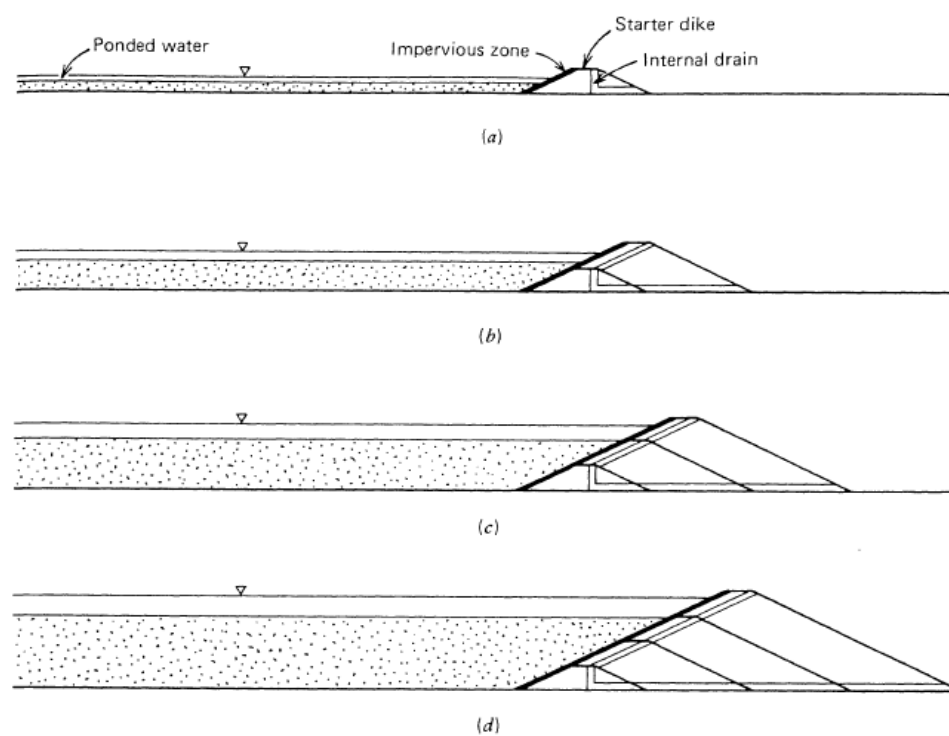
Sequential raising using the downstream raised embankment dam construction method (Vick, 1983)
